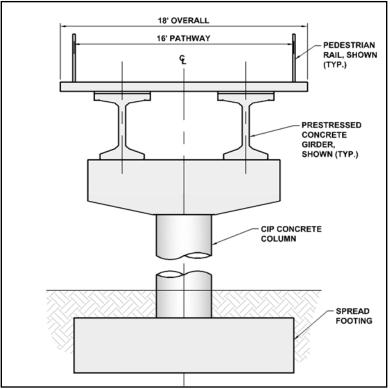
Northern White River Bridge Trail Approach – Girder Section
